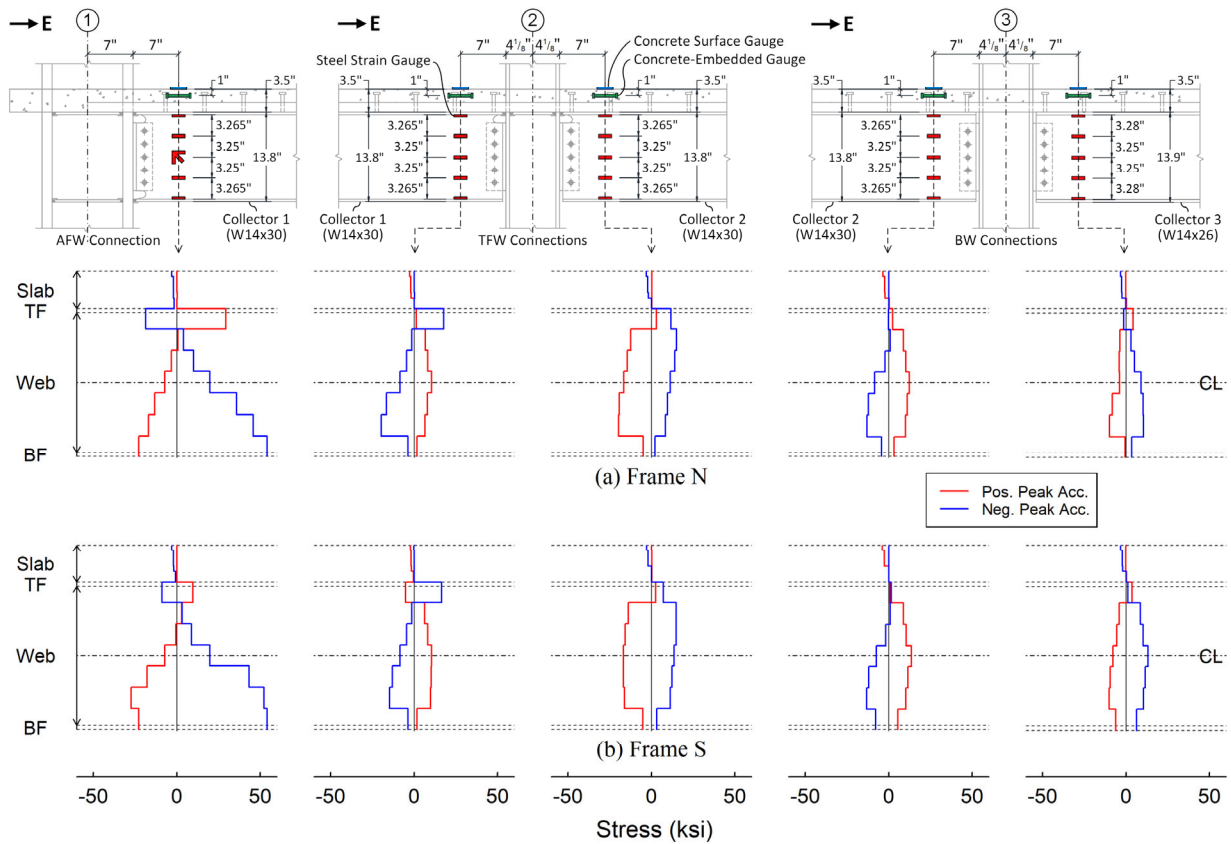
Test 2B-5: Fiber Section Stress Profiles of 2<sup>nd</sup> Floor Collector Connections
